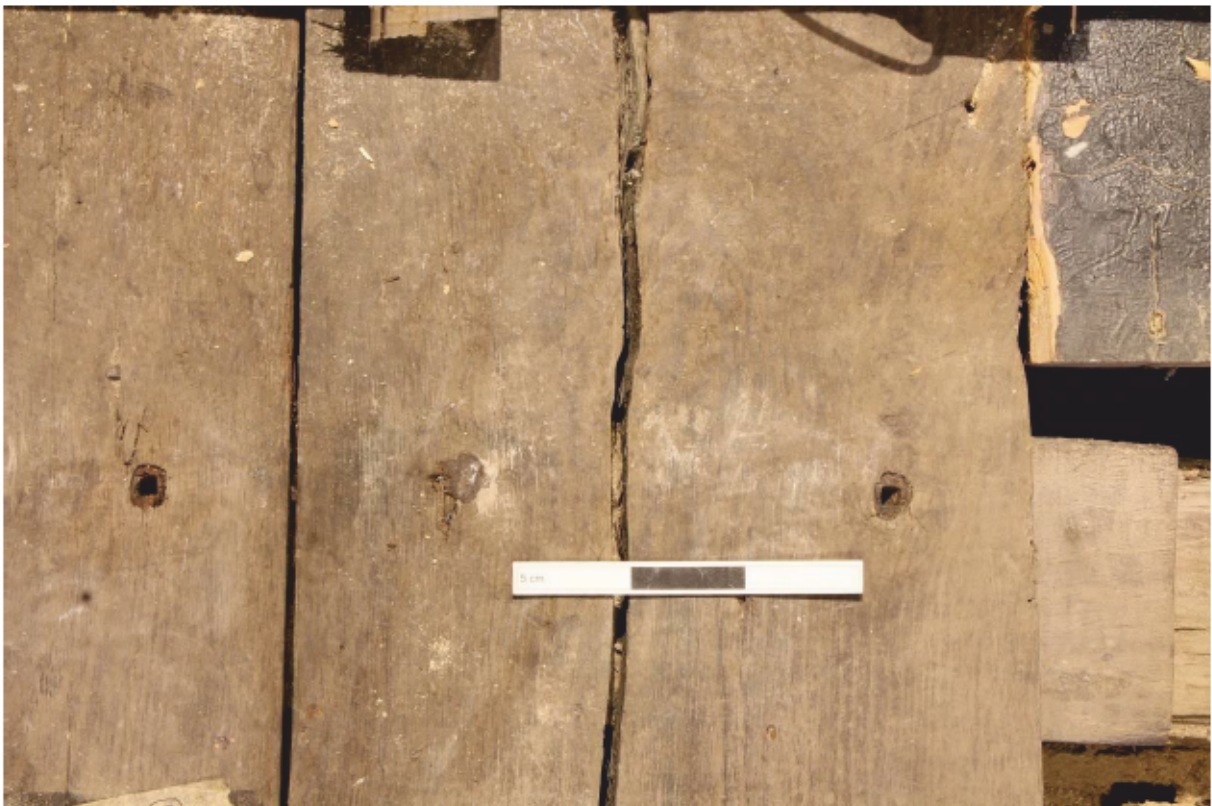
Bay IV Floorboards (49 and 50) east, detail of historic nails (0.15m scale)
